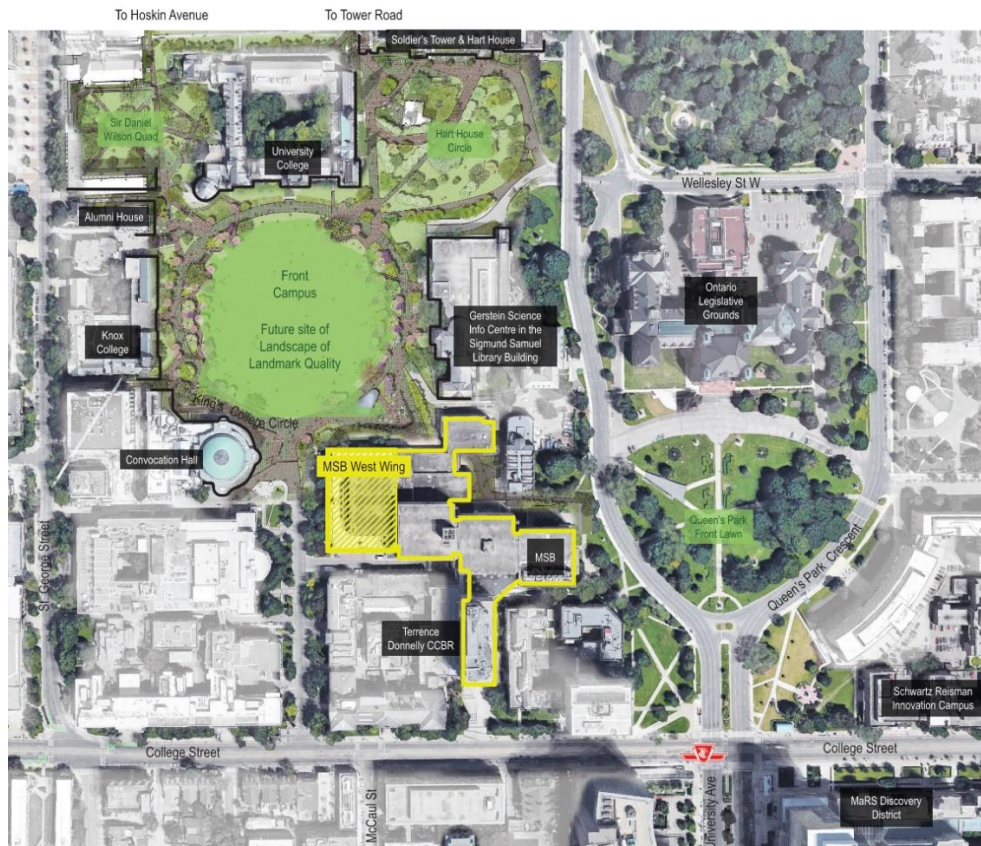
Context Site Plan University of Toronto, St. George campus, MSB West Wing
